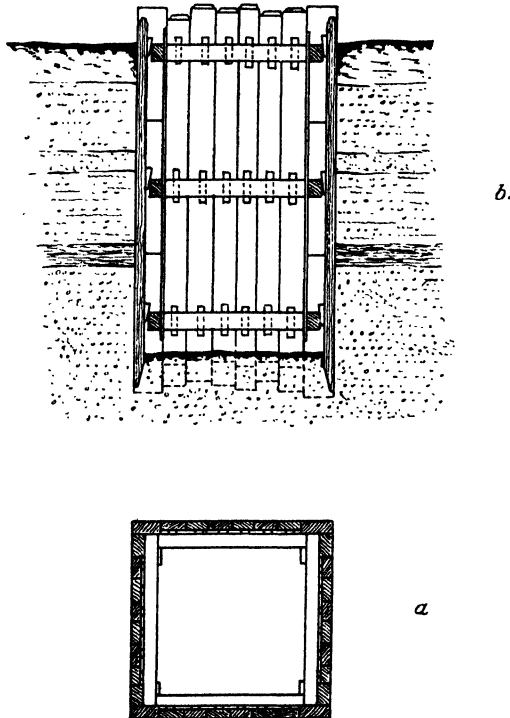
Test Pit, with One Setting of Runners. (*a*) Plan ; (*b*) Section.
